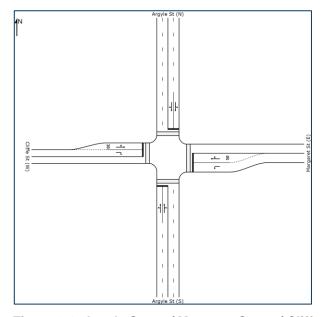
Argyle Street / Margaret Street / Cliffe Street Intersection Layout
